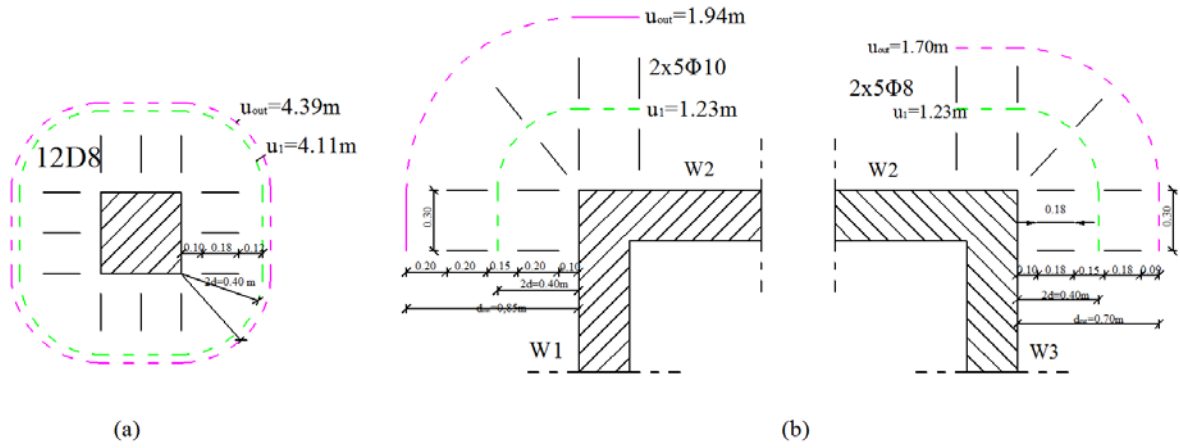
Punching shear reinforcement detailing at the connections of the slabs: (a) to the columns and (b) to the shear walls corners
